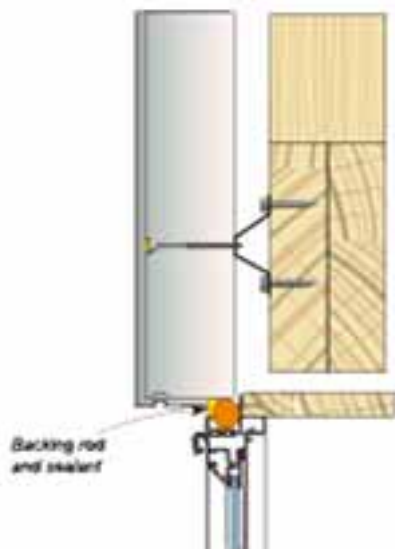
Alternative Window Sill Detail - Timber Frame Window
